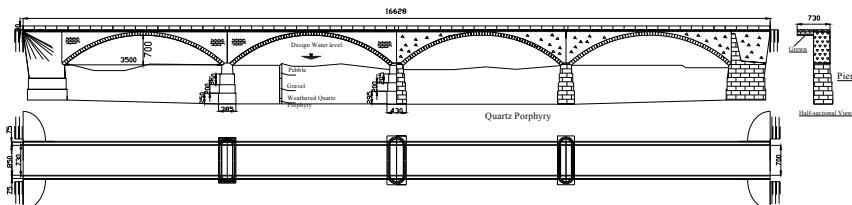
Overall layout of old bridge before strengthening and reconstruction
